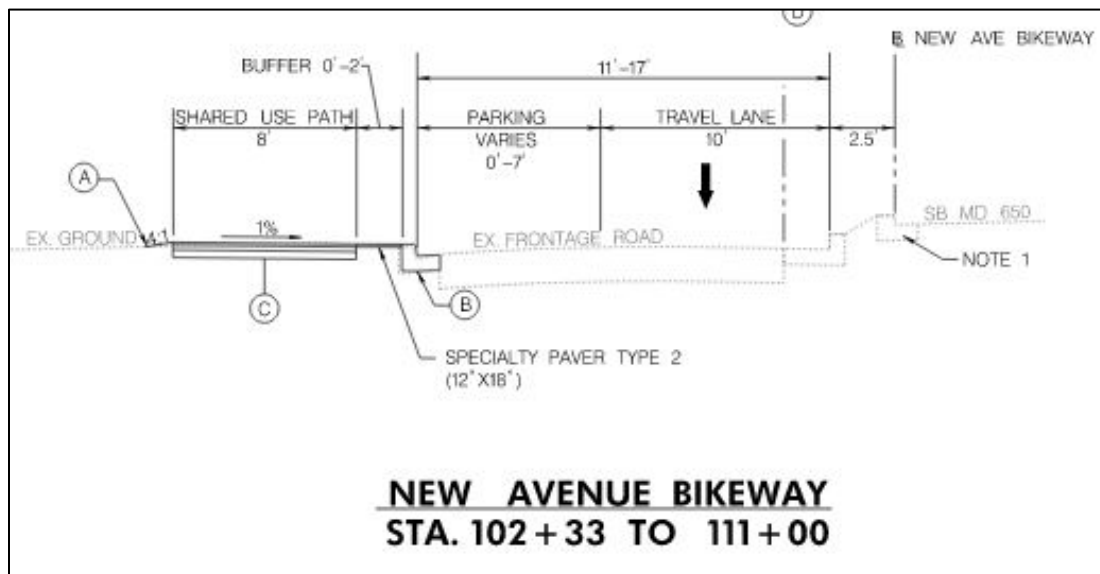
Sidepath Between Larch Avenue and Auburn Avenue – Proposed Cross Section
